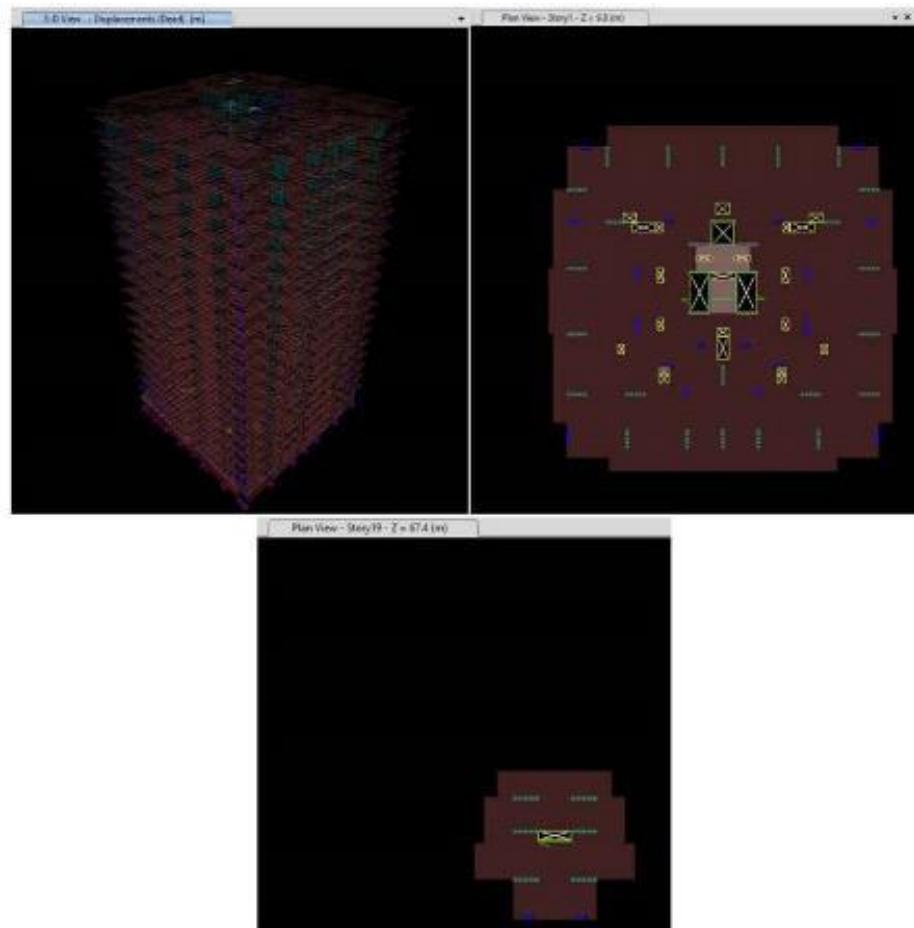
Projection of the Building under investigation in a horizontal plane
